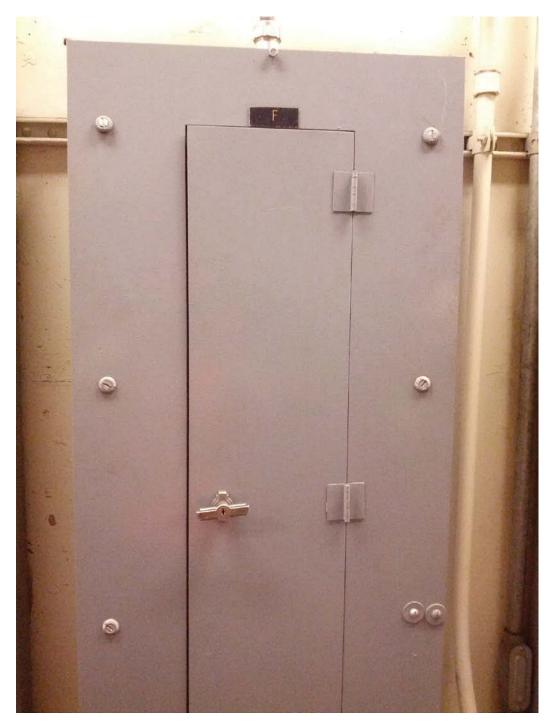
D04 Federal Center SW – Ducts & conduits running up wall in maintenance corridor
